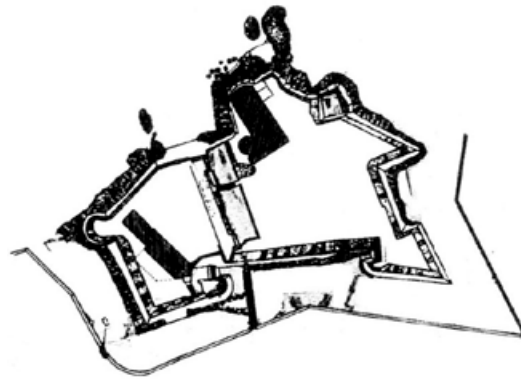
Layout of the first fortified complex as built between 1542-1544 (floor plan of the Cathedral, not yet demolished)
